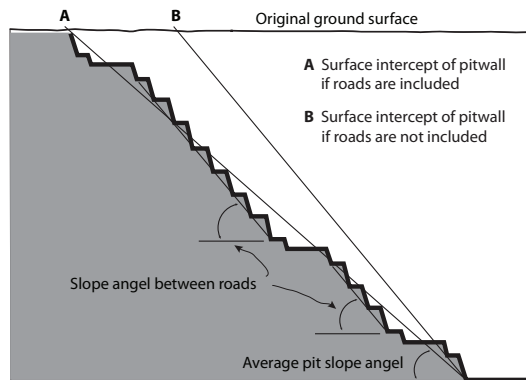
Vertical section through a pit wall (Source: Atkinson, SME, 1983)
